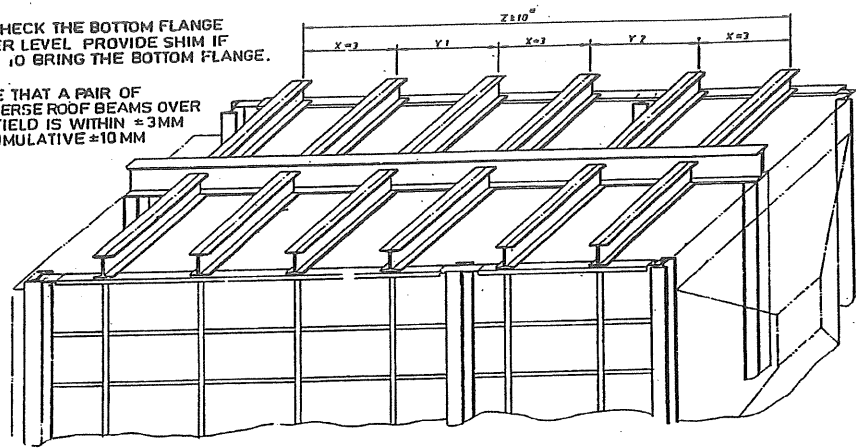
SPACING OF ROOF BEAMS WITH TOLERANCES
